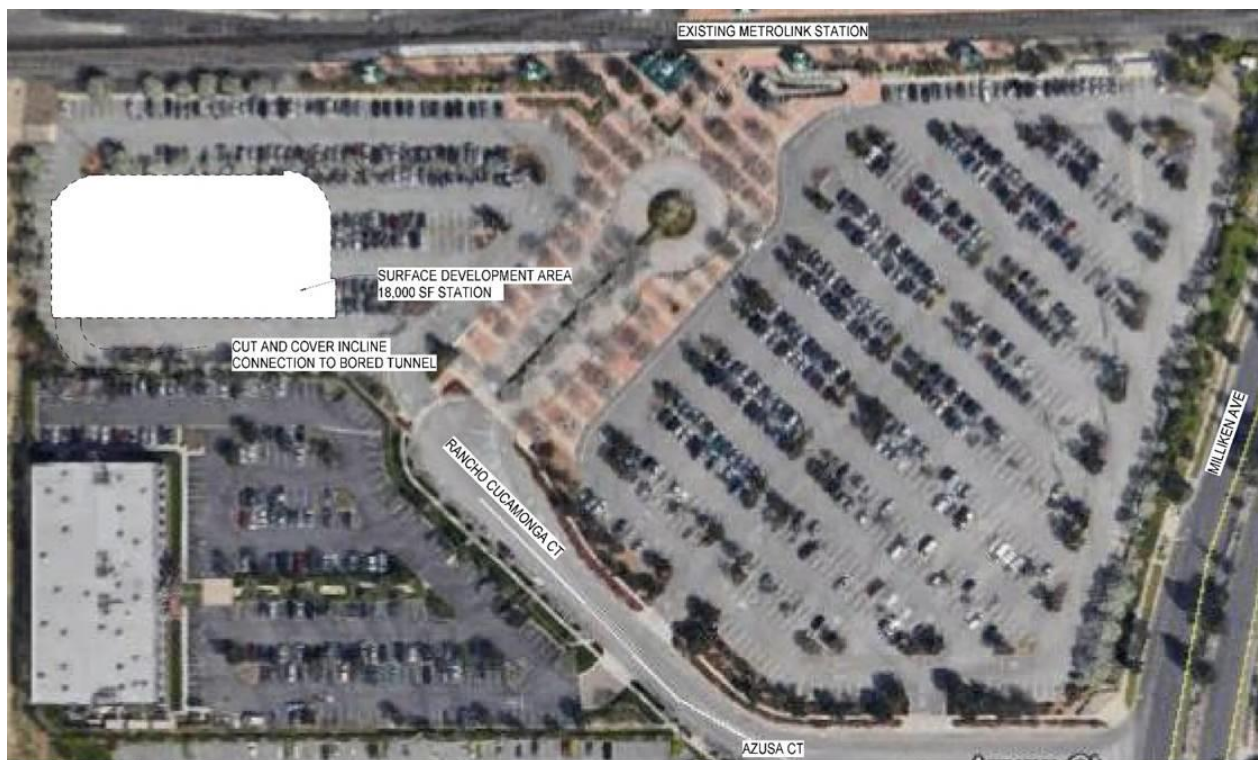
ONT Airport Stations Proposed Conceptual Station Plan
